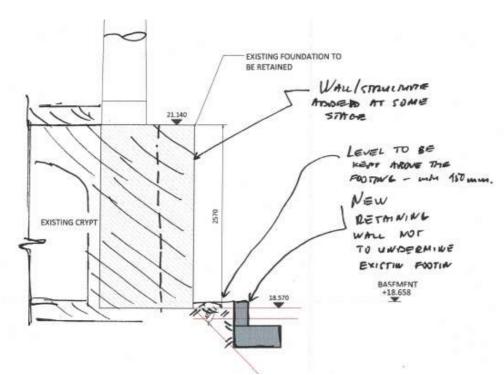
Proposed Work in the Area to the West of the Colonnade
